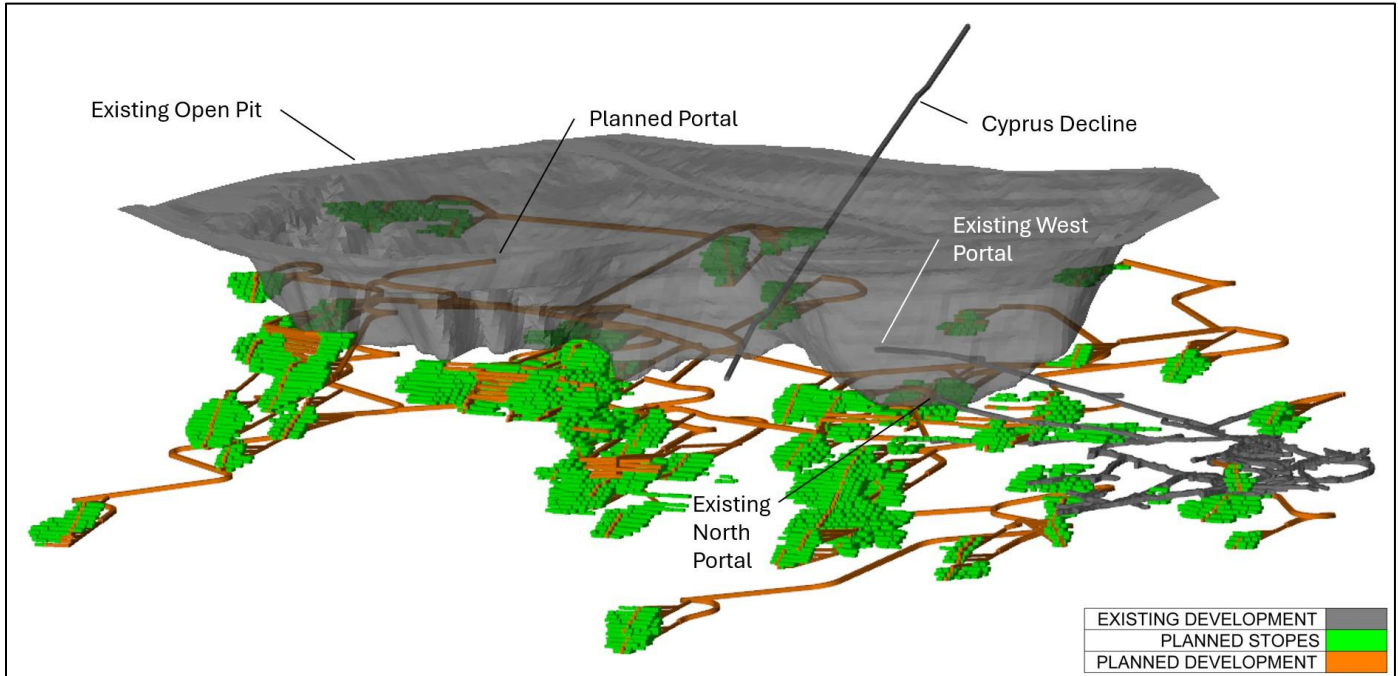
Copperstone Underground Mine Design (looking southwest)
